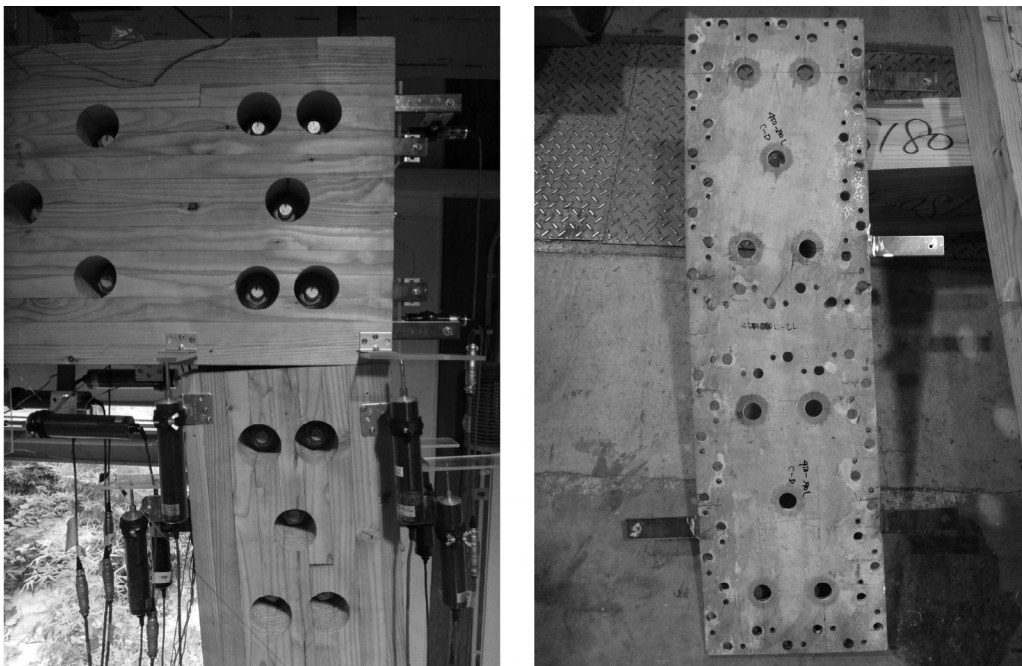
Beam-column joint in test(Left) and steel plate of D-member of column after test(Right)
